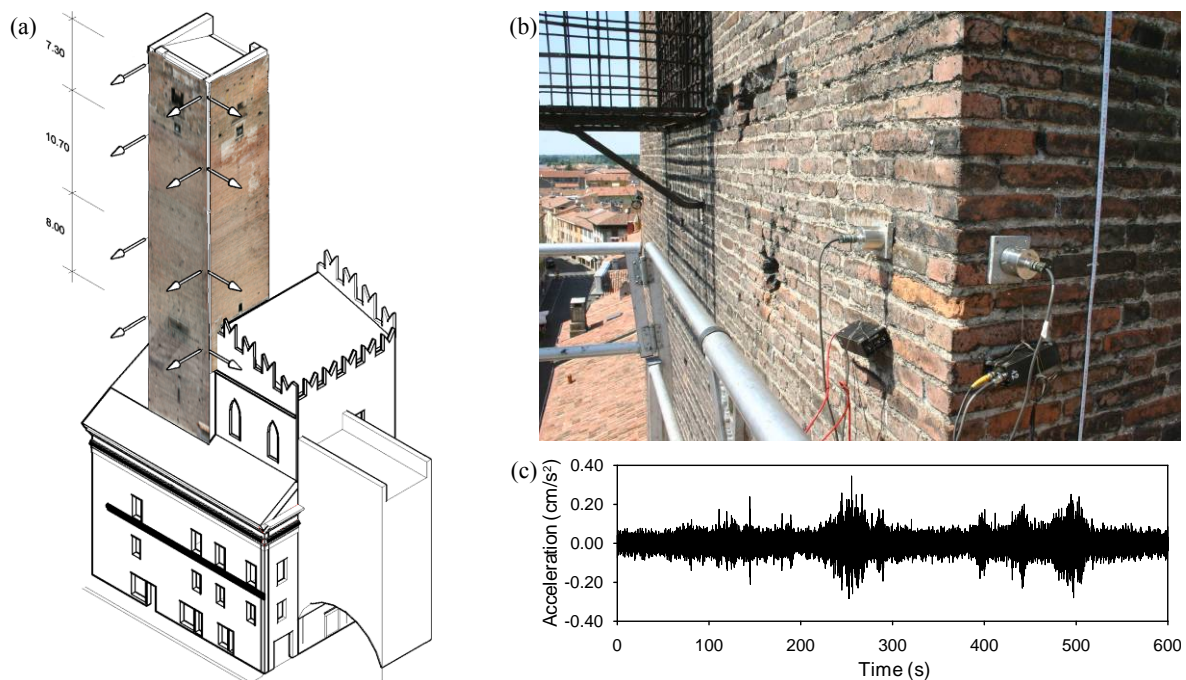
(a) Sensor layout adopted in ambient vibration testing of the *Gabbia* tower (dimensions in m); (b) typical mounting of accelerometers; (c) sample of acceleration recorded at the top of the tower
